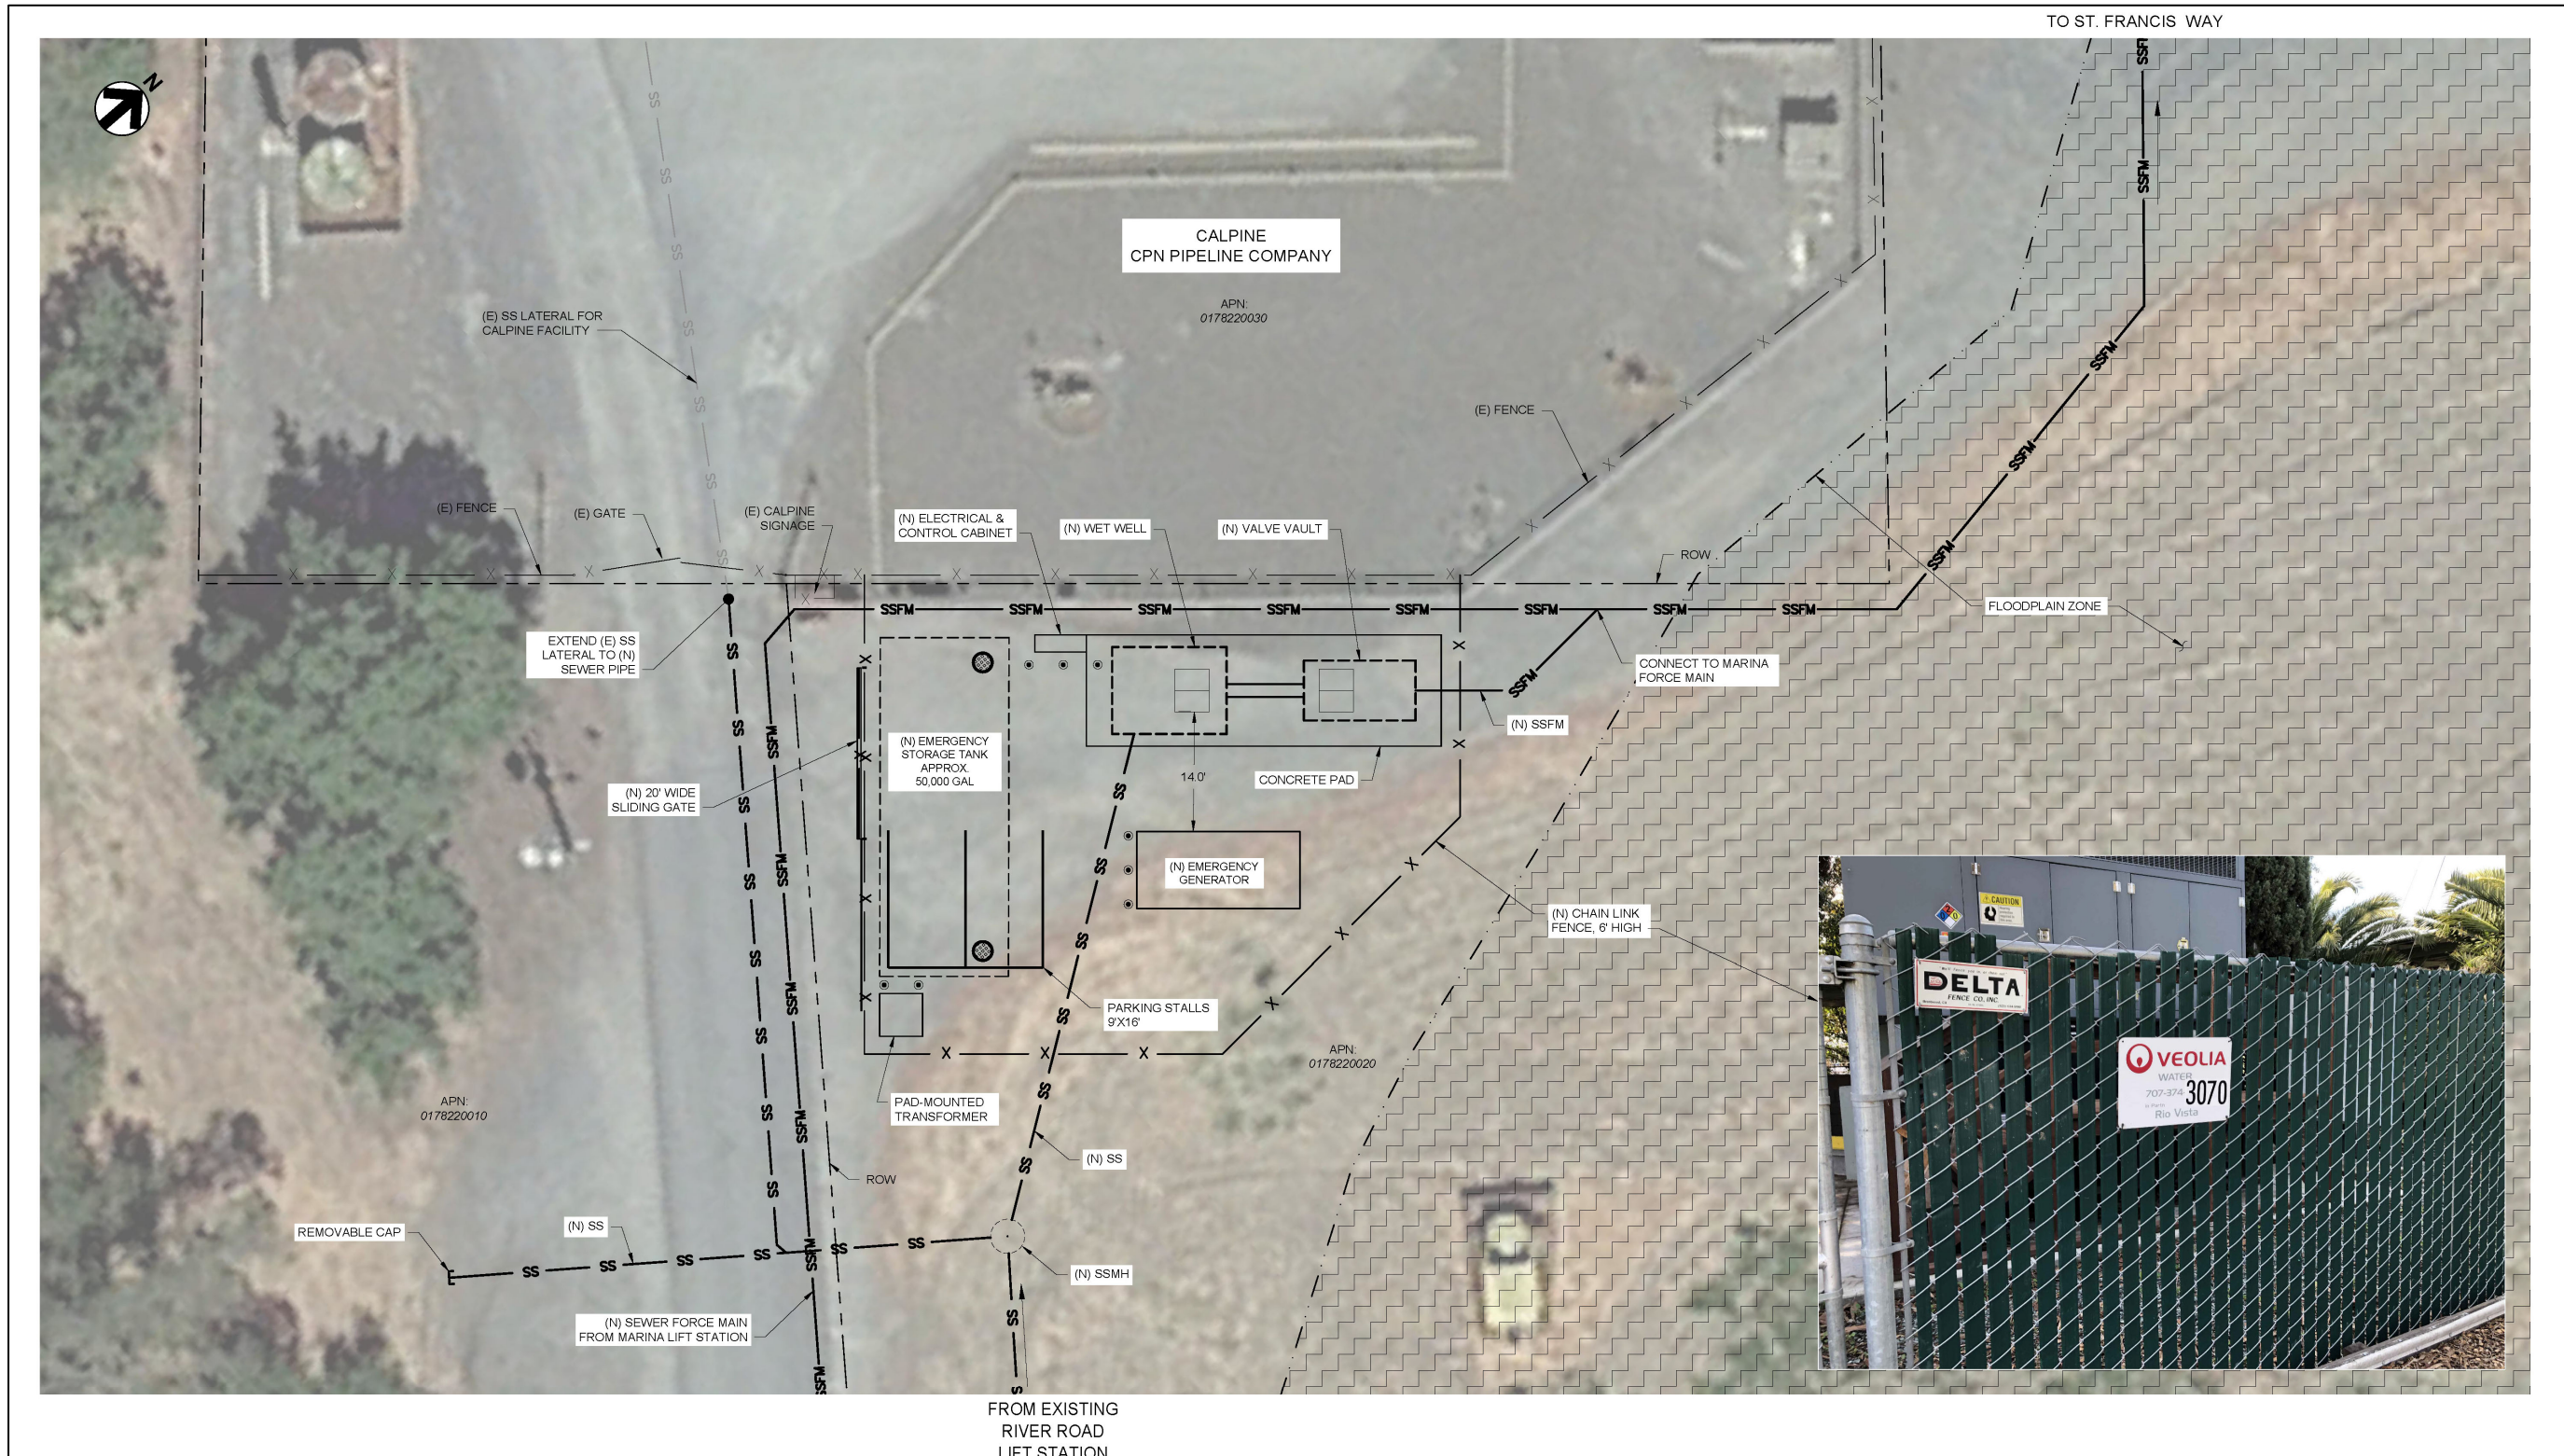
River Road Lift Station Relocation – Draft Conceptual Site Plan
